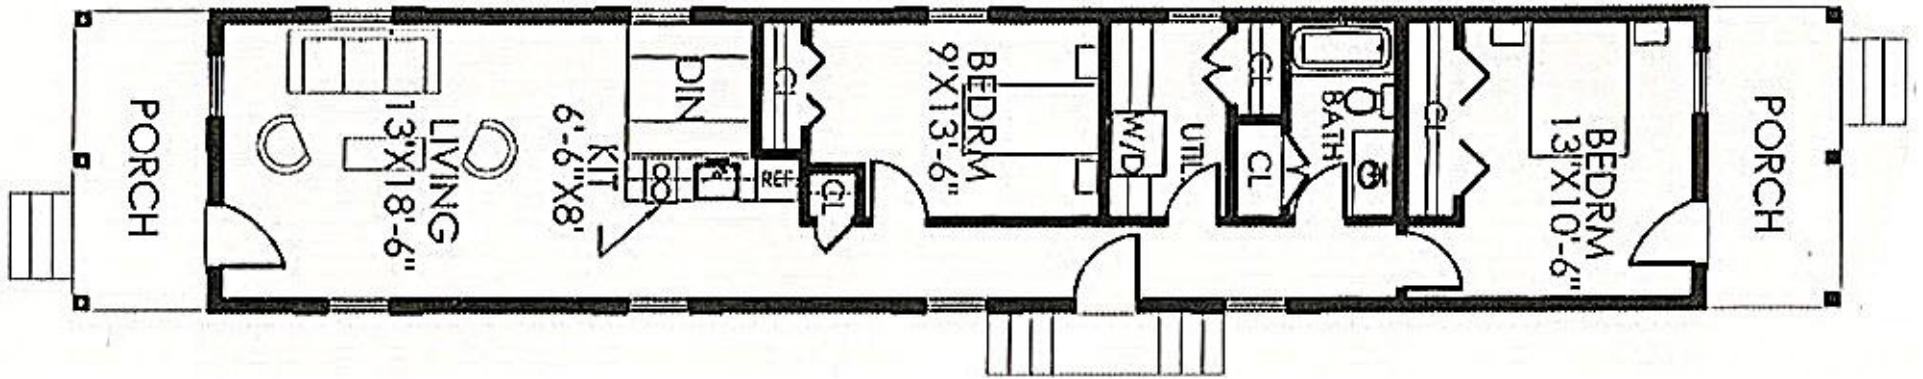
Plan view of a single barrel, triple-bay shotgun house.
